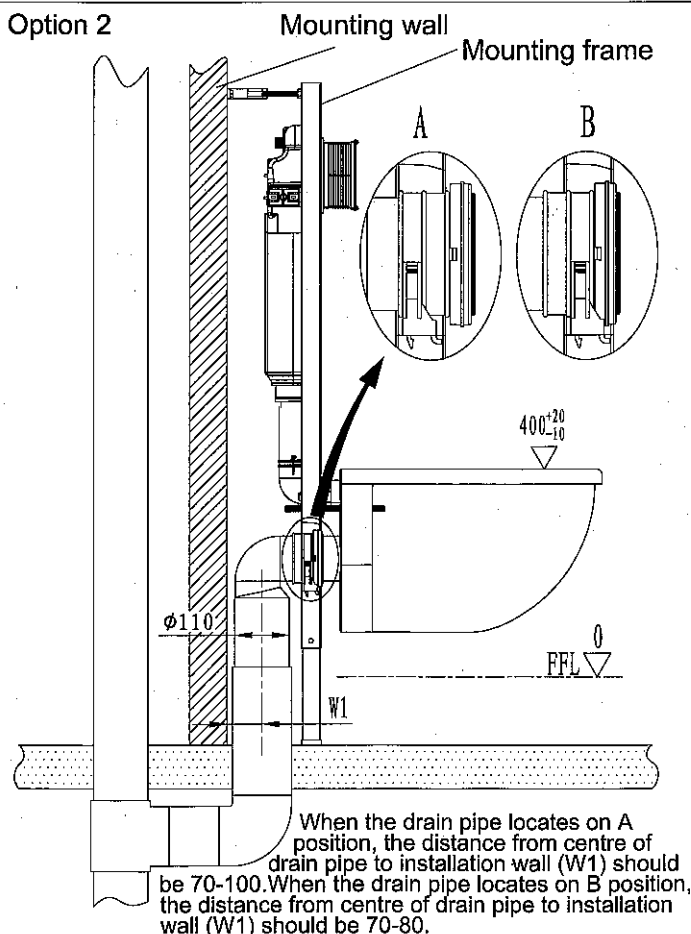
to 3 are three different installation systems for drain pipe. Customer should confirm whichever installation system according to drainage outlet position. If drainage outlet does not fall within the three systems, customer should follow one of three drainage system layout to correspond installation of our concealed cistern.
